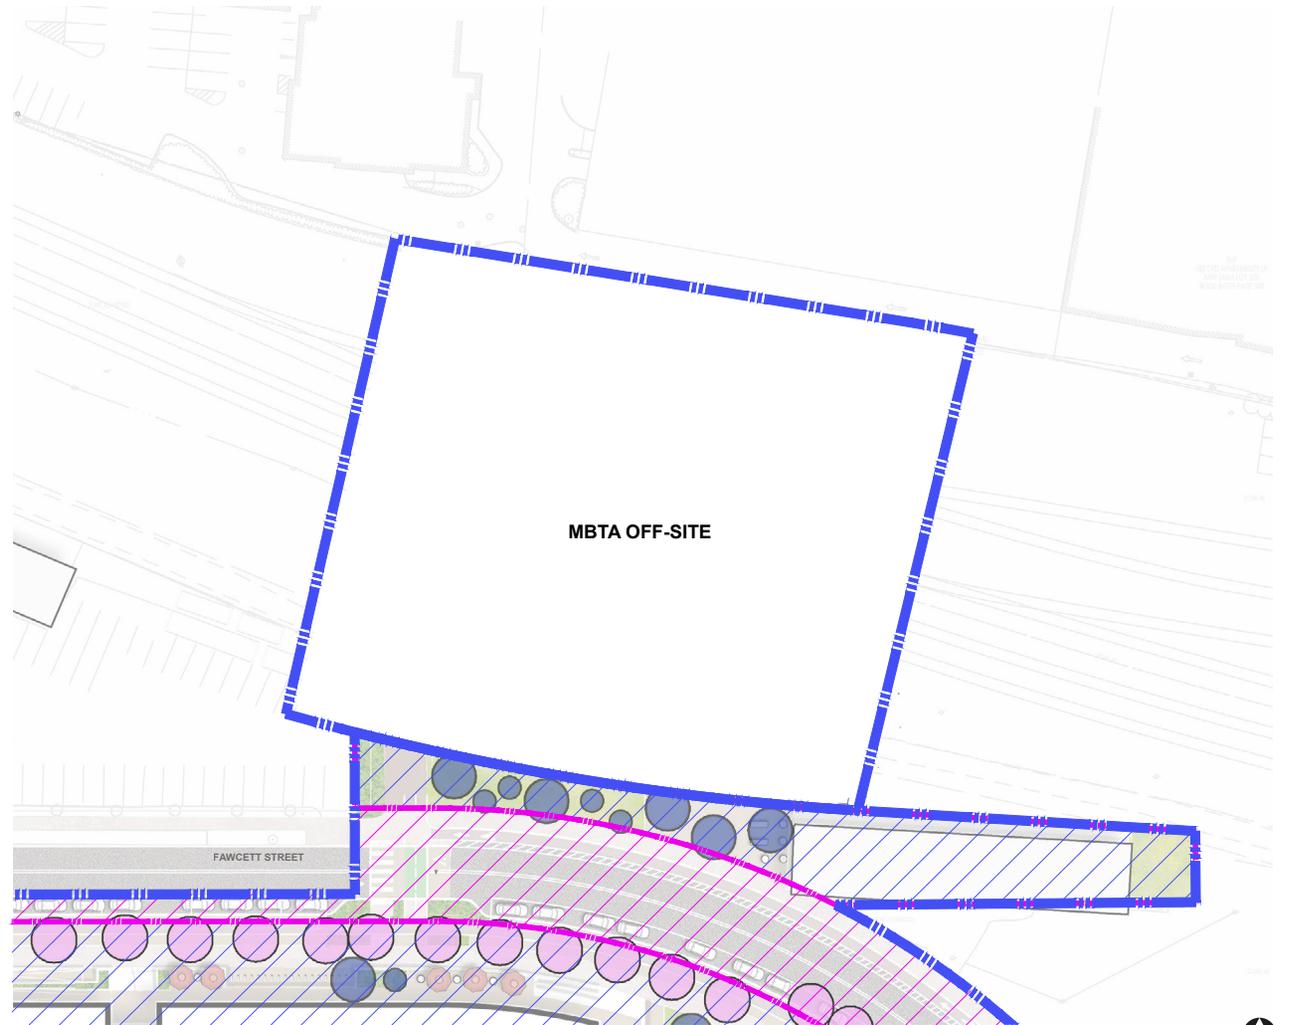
A.3f: Proposed Tree Plan - MBTA Offsite
